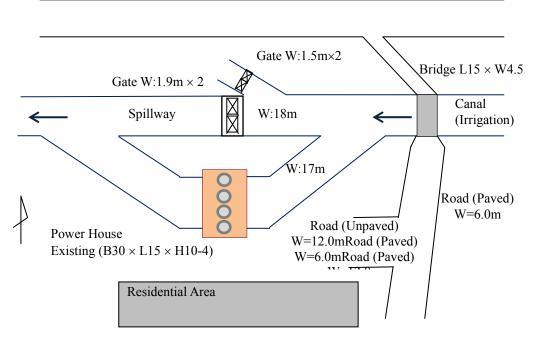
Power Facility Plan at Bohtar Site
